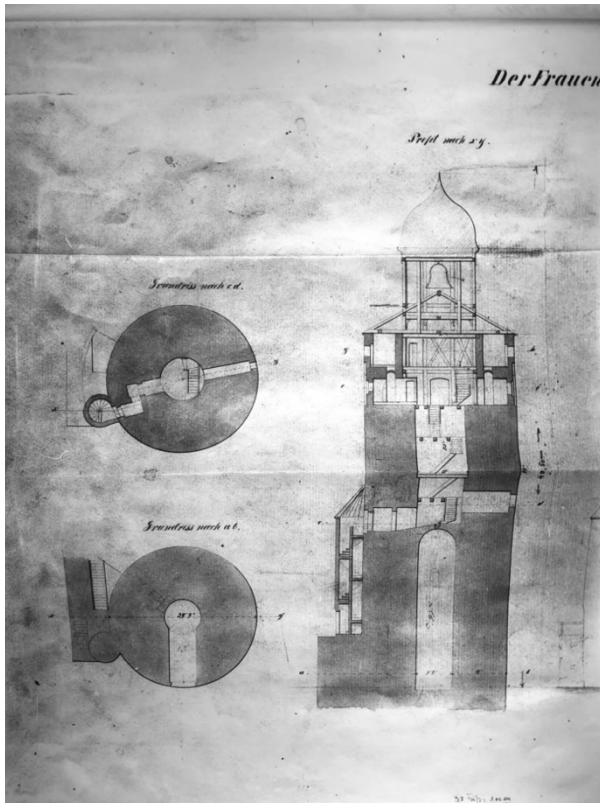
Historic drawing of the Frauen Thurm, section and two floor plans, 1805. Building Archive Görlitz, Grdb.-Nr. 10690, Bauakte Bd. II.
